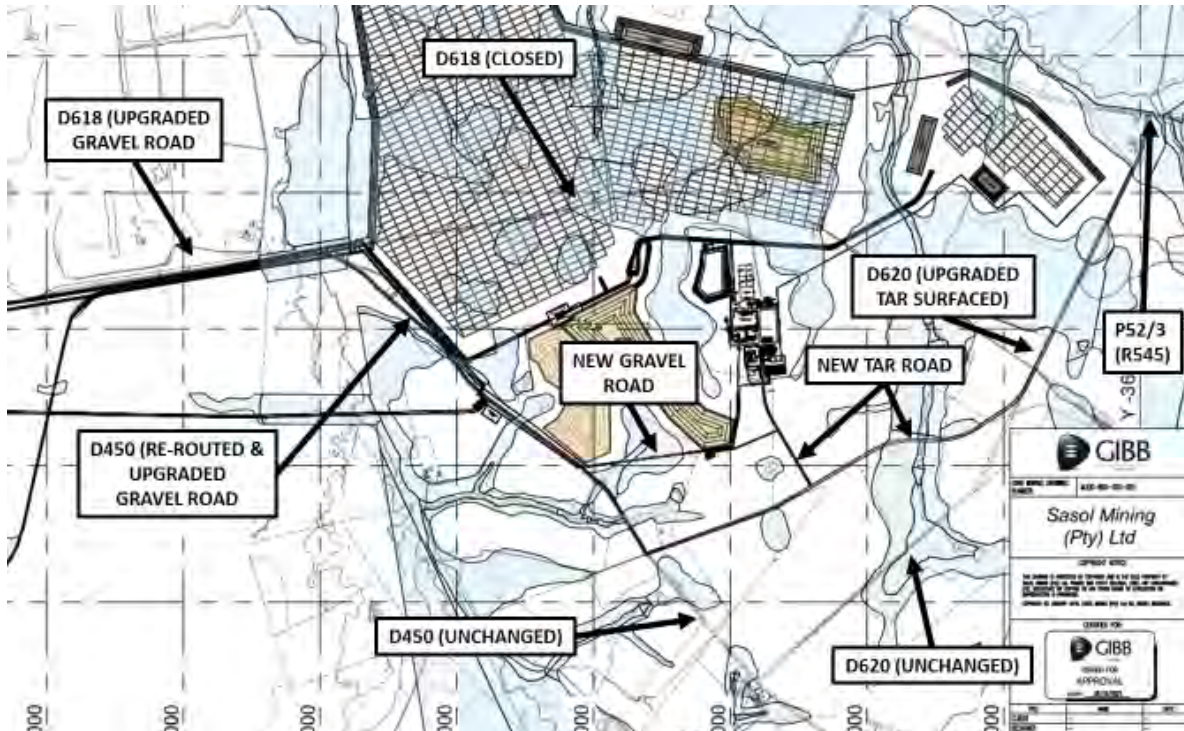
Proposed Combined Road Works (GIBB, 2021).
